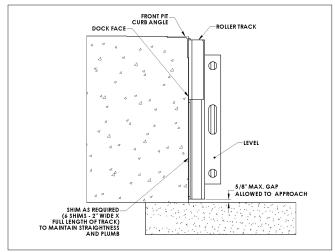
E—WELDING ROLLER TRACK SIDE VIEW
